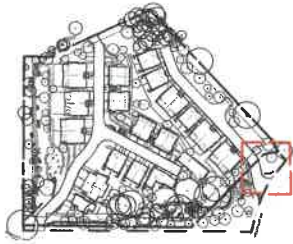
DETAIL PLAN: TERRACED WALL TOWNHOUSE PLANTING CONCEPT
